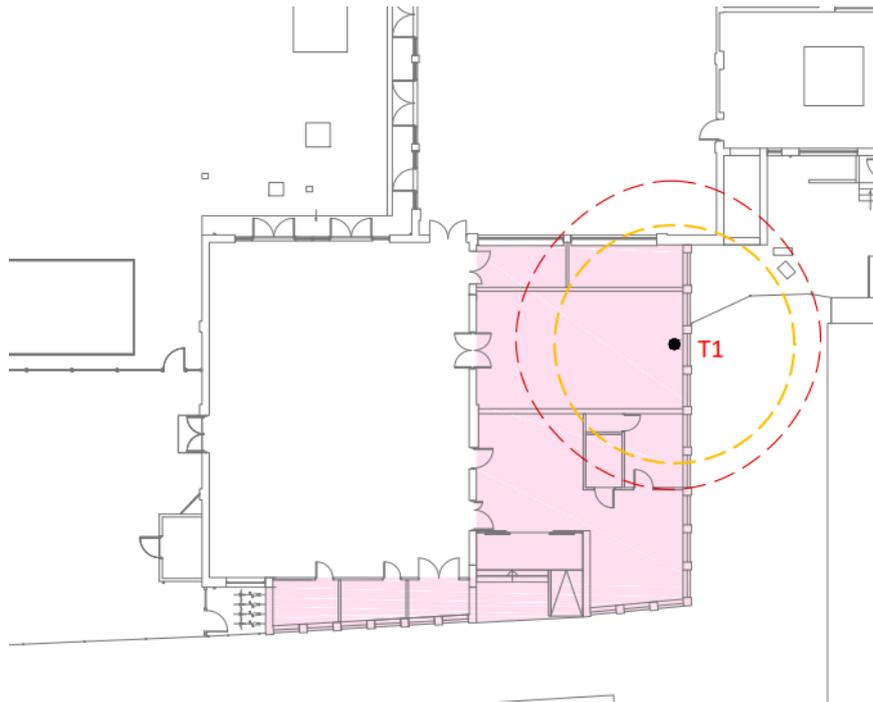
Floor plan showing proposed extension and position of tree (T1) to be removed
